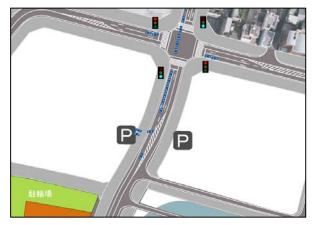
Example of the Application (Improve of the cars going in and out the roadside)
